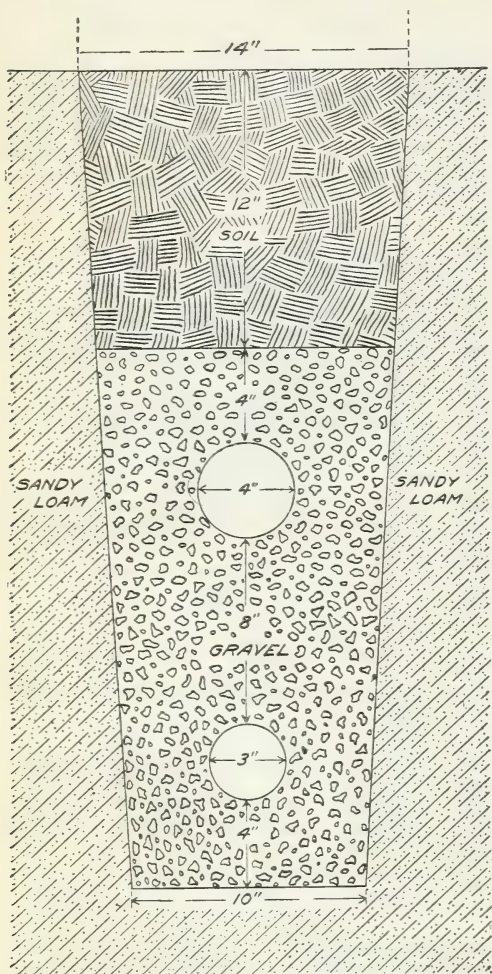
Cross section of single tile sewage disposal system, showing second tile below for underdrainage.
